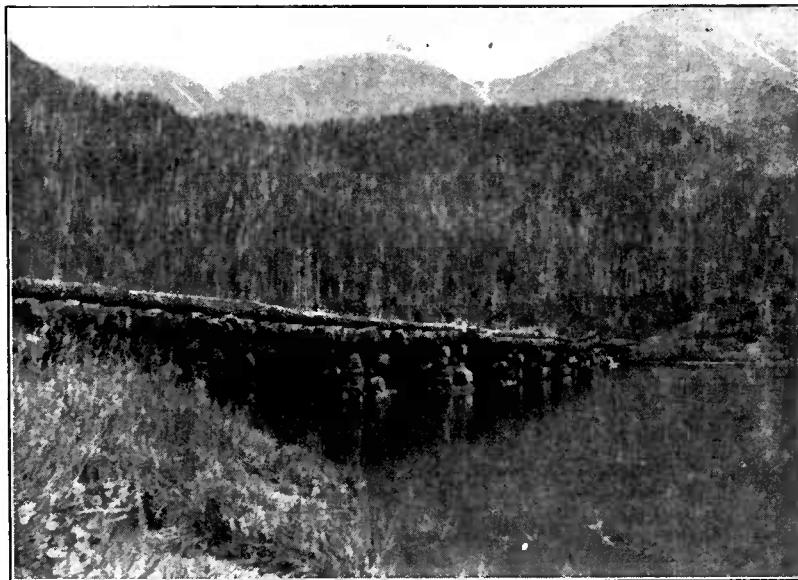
Bridge suitable for crossing a swamp or shallow stream. The piers, 20 to 30 feet apart, are built up of cribbed logs
